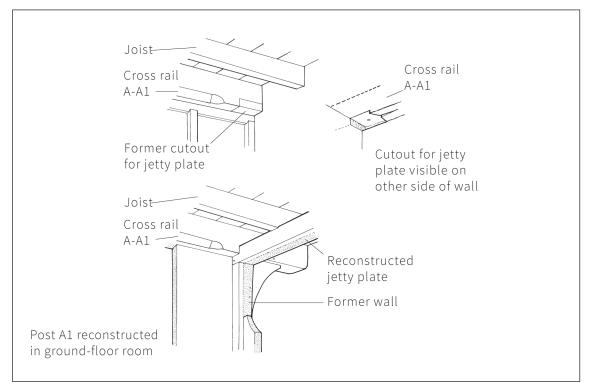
2 Waterside, detail of the ground-floor post (A1) showing cut out for jetty (Drawing Allan Adams © Historic England).
